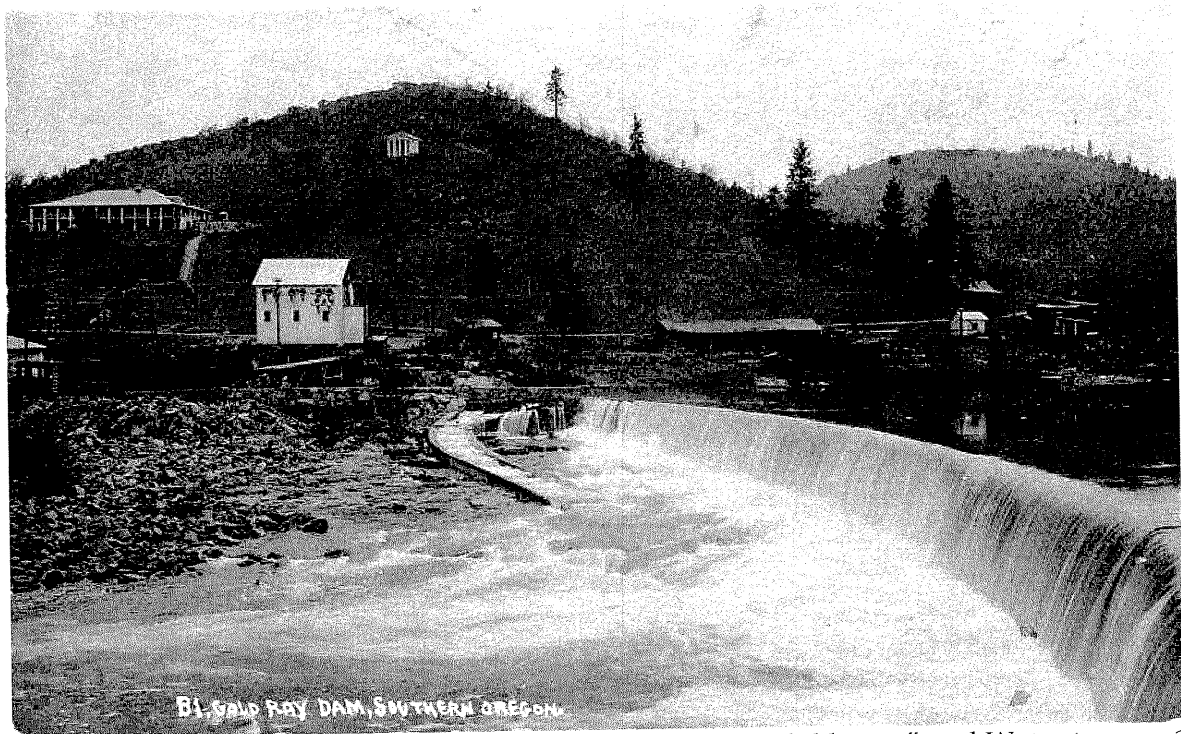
HISTORIC: Gold Ray Dam, looking north, toward "Clubhouse" and Water tower, c1910
